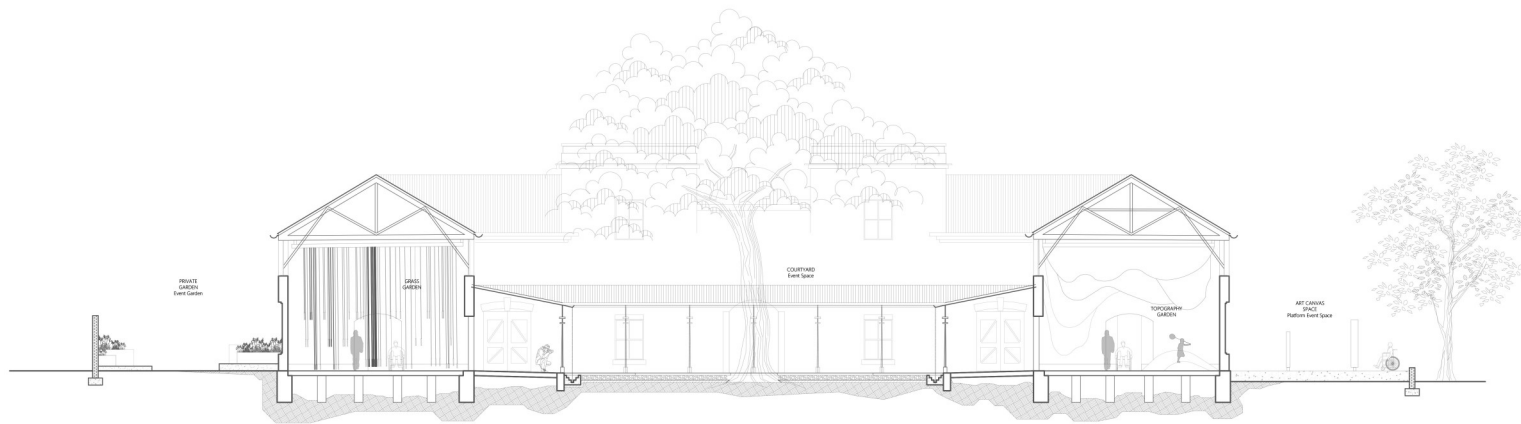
Proposed Elevation of the Staatsmuseum North Wing Design 1:20 (Author 2020)
